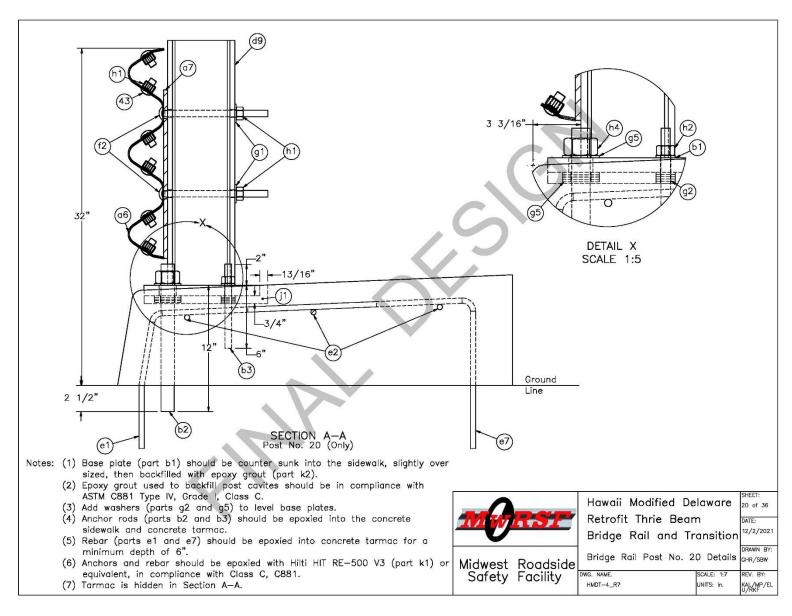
Bridge Rail Post No. 20 Details, Test No. HMDT-4
